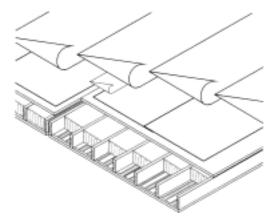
Section of typical roofing cassette (Icopal 1996)
